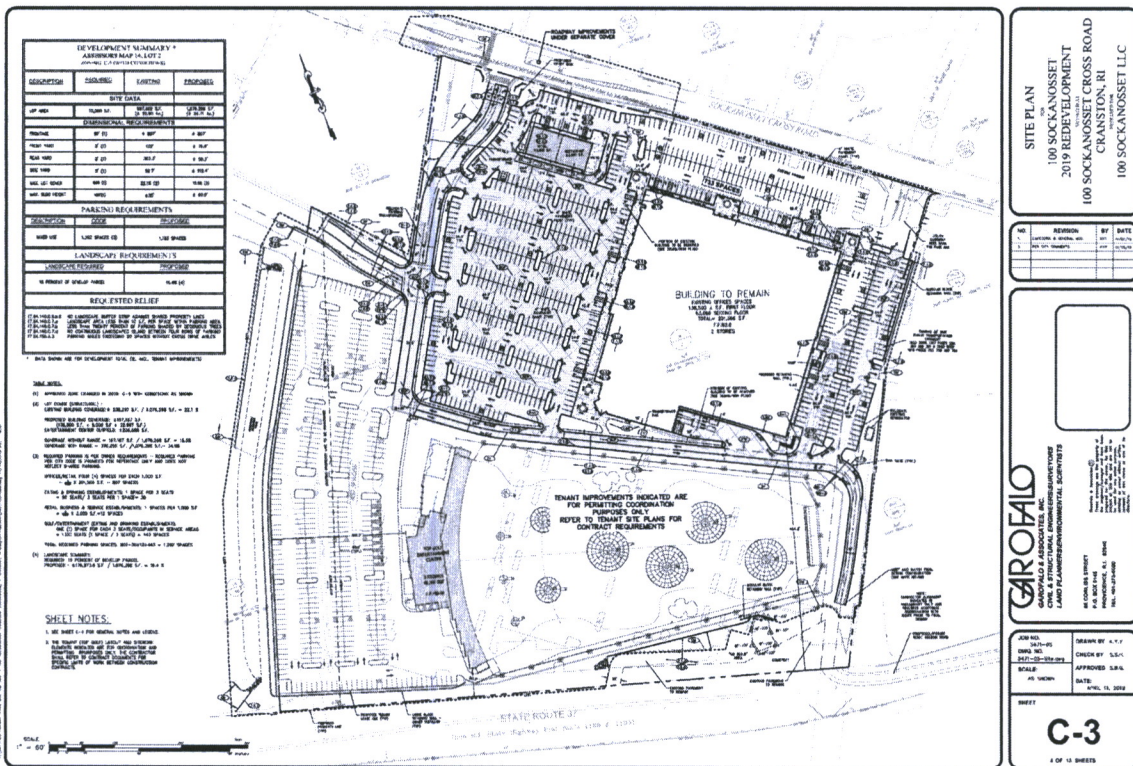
100 Sockanosset Cross Road proposed development plan.
